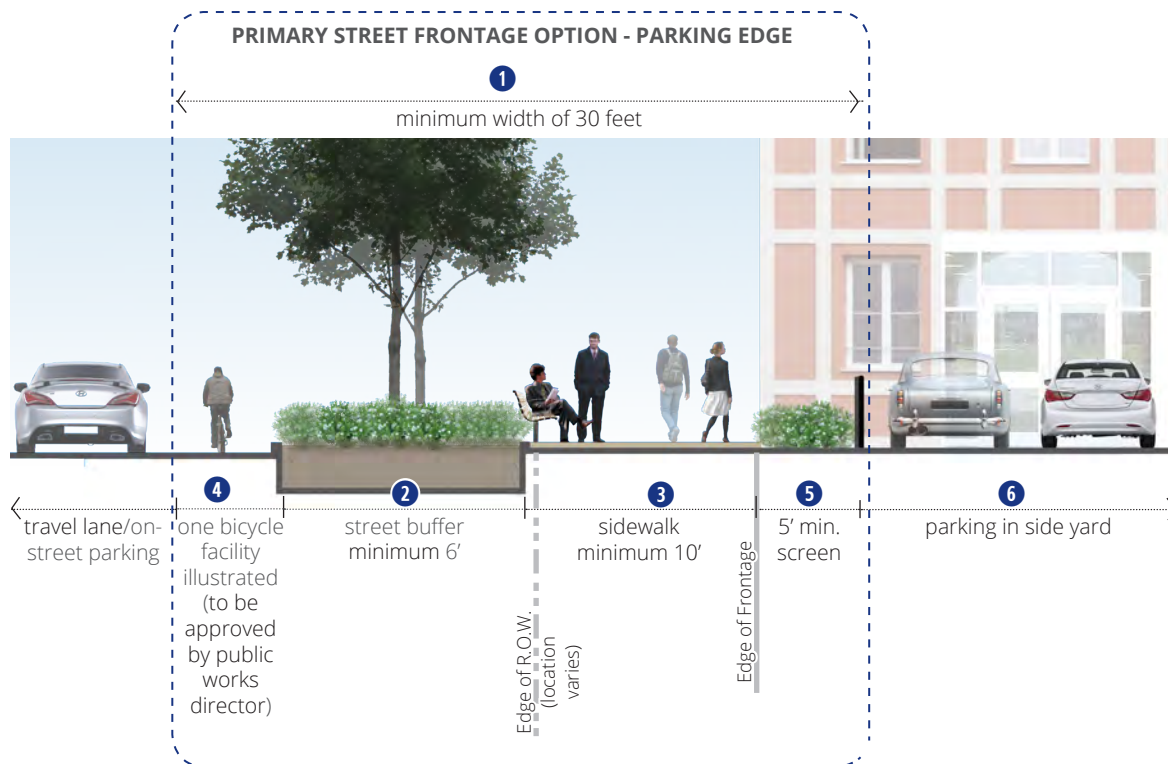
Primary Street Frontage Option - Parking Edge
